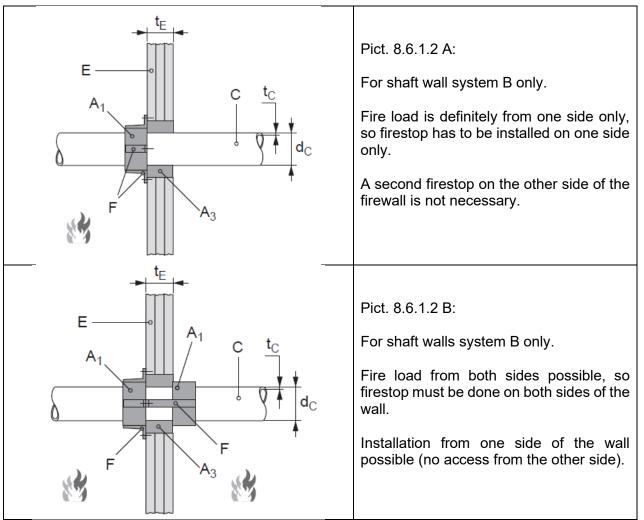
Single plastic pipe penetration in Shaft wall system B with fire load from one/ two sides
